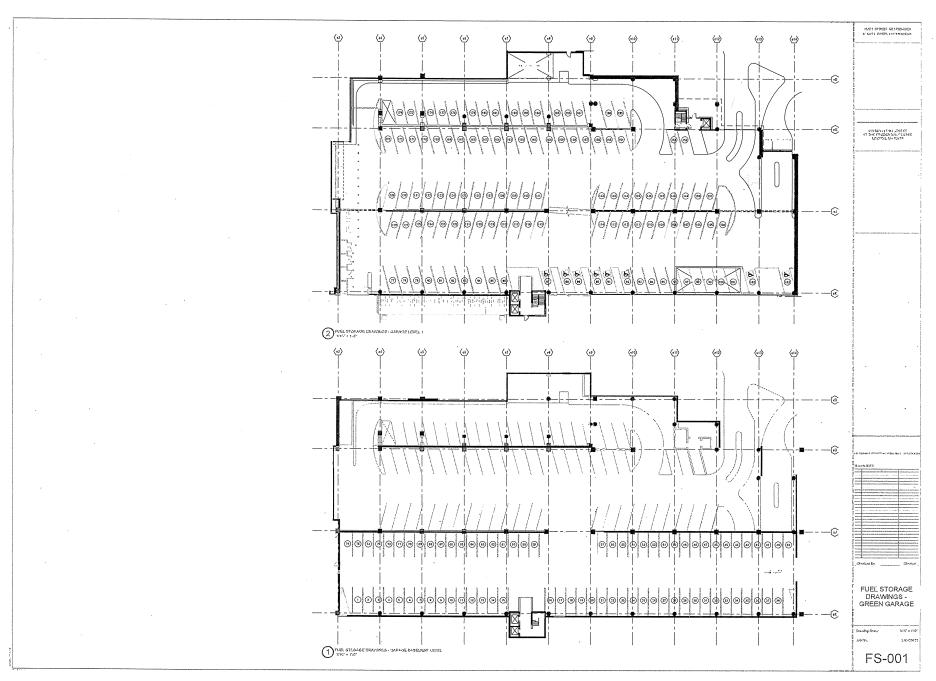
Proposed Layout Green Garage (824 Spaces)
